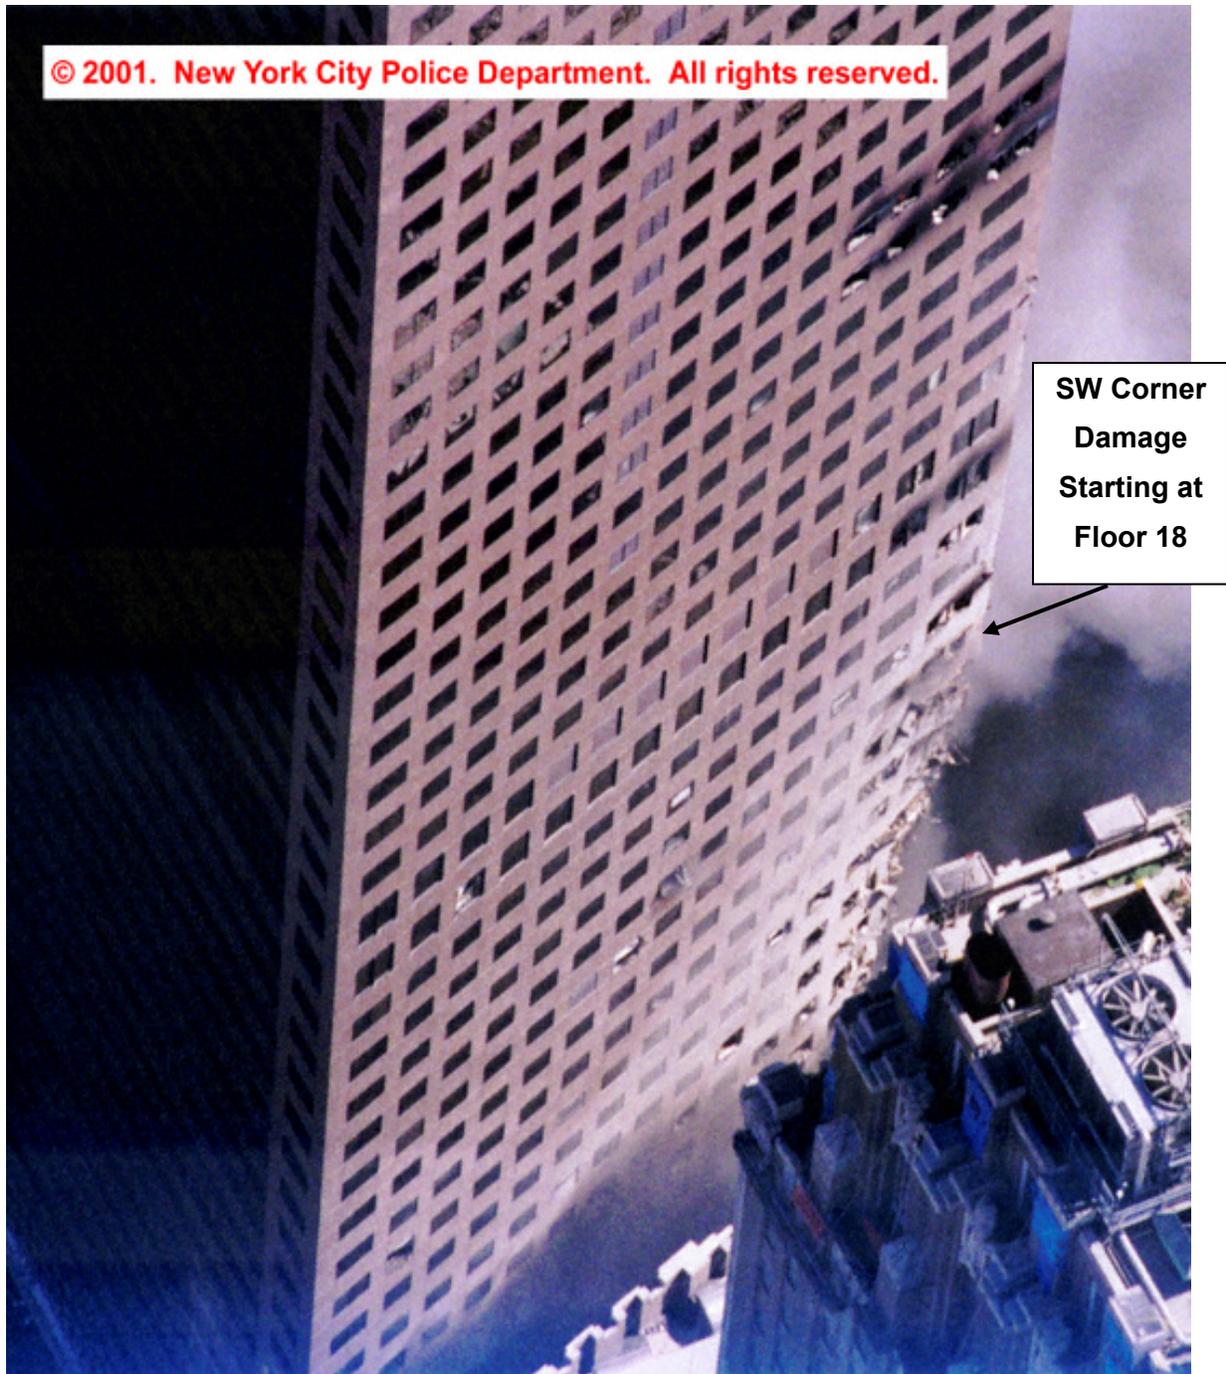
Debris damage around Floor 18 of the southwest corner.
